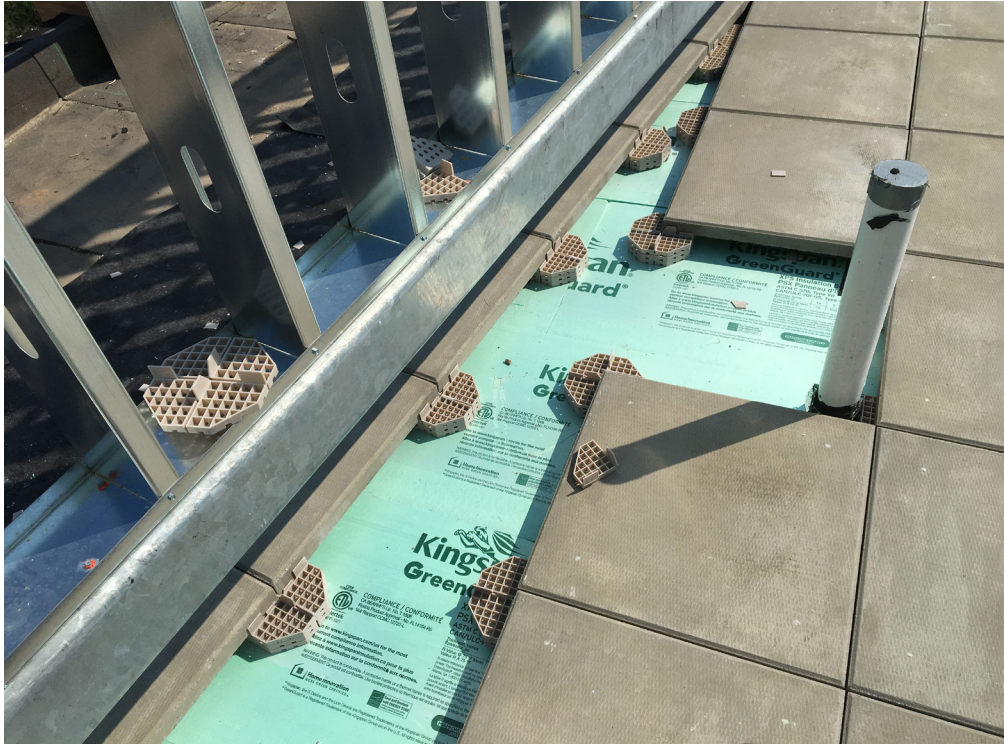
XPS insulation used in a PMRA for a building being constructed in Washington, DC. Heavy pavers are used to ballast the XPS insulation. Photo courtesy of Kingspan.
